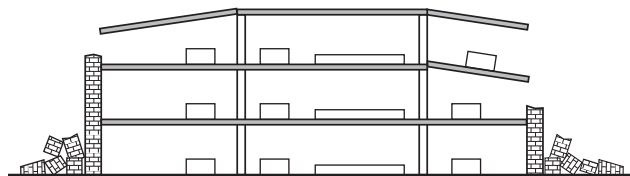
(b) Wall-Fall Collapse Pattern — Heavy Wall — URM Construction.
